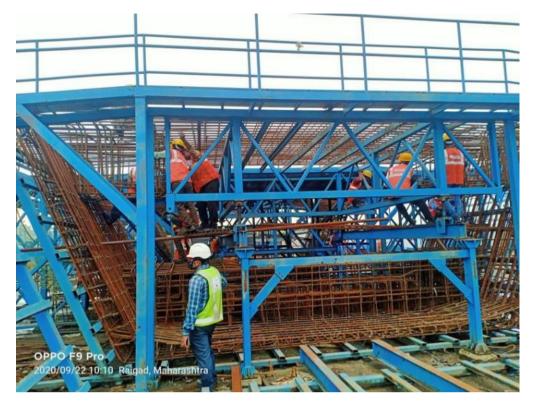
Segment Reinforcement Cage Works at Bay-1 in progress
